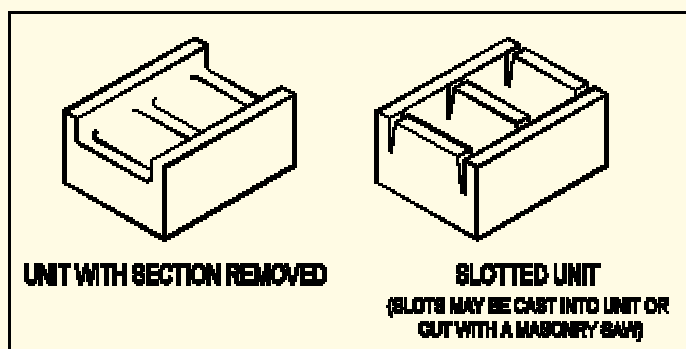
TYPICAL BOND BEAM BLOCK TYPES
